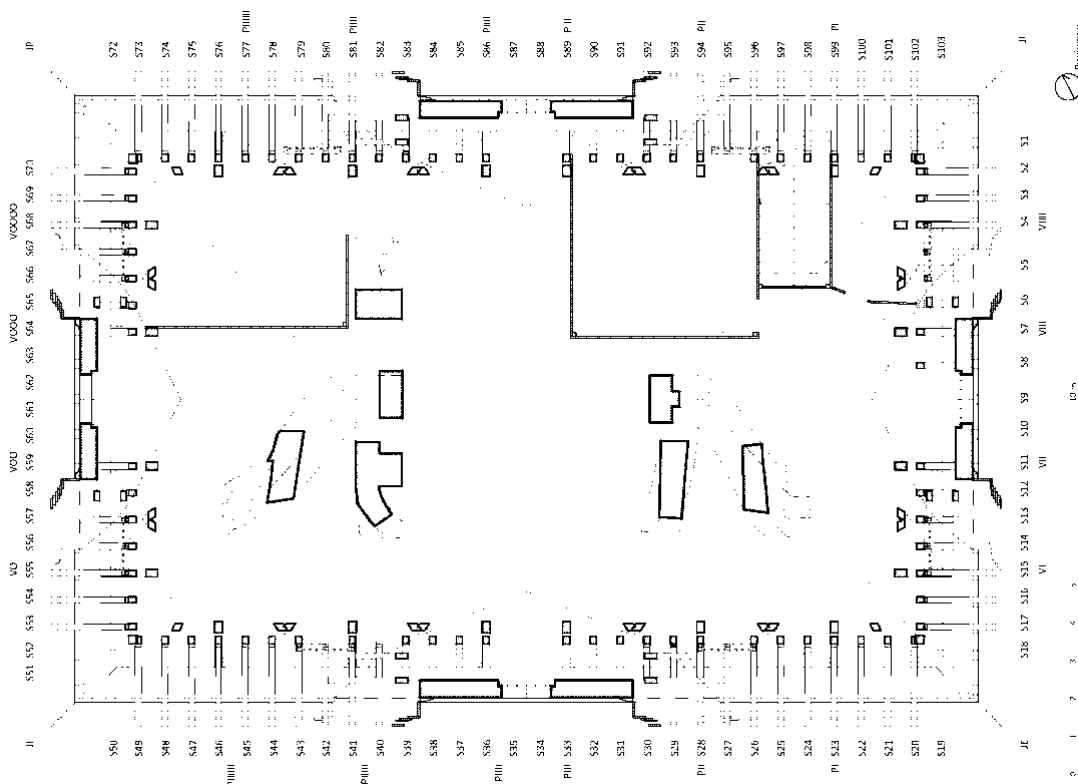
Floor plan of the attic, inscribed with the coding of the rafters and posts. Livady Architects.
